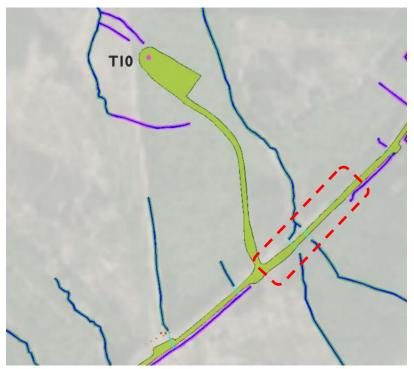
Spine Road south of T10 Peat Stabilisation Berm plan
